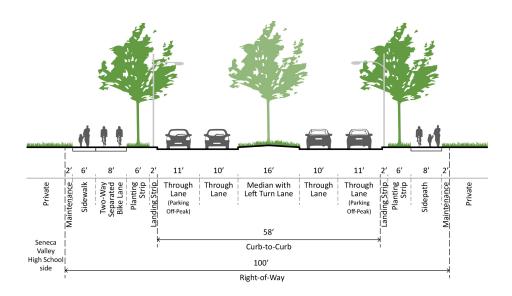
Proposed Typical Street Section for Wisteria Drive from Crystal Rock Drive to Great Seneca Highway
